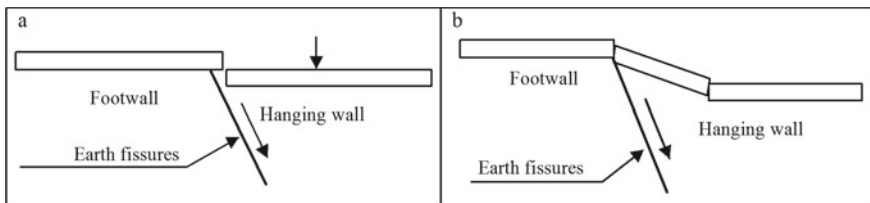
Illustration of disaster modes for a steep slope type road surface damages and b double-section steep slope type road surface damages (Peng et al. 2017)
